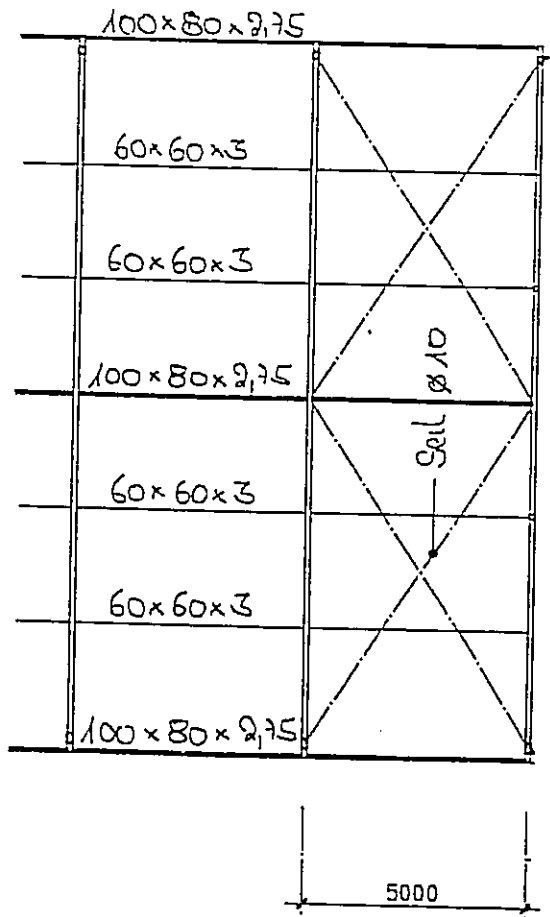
Section Assignment, 15 m H 3.84 (Side Wall)
